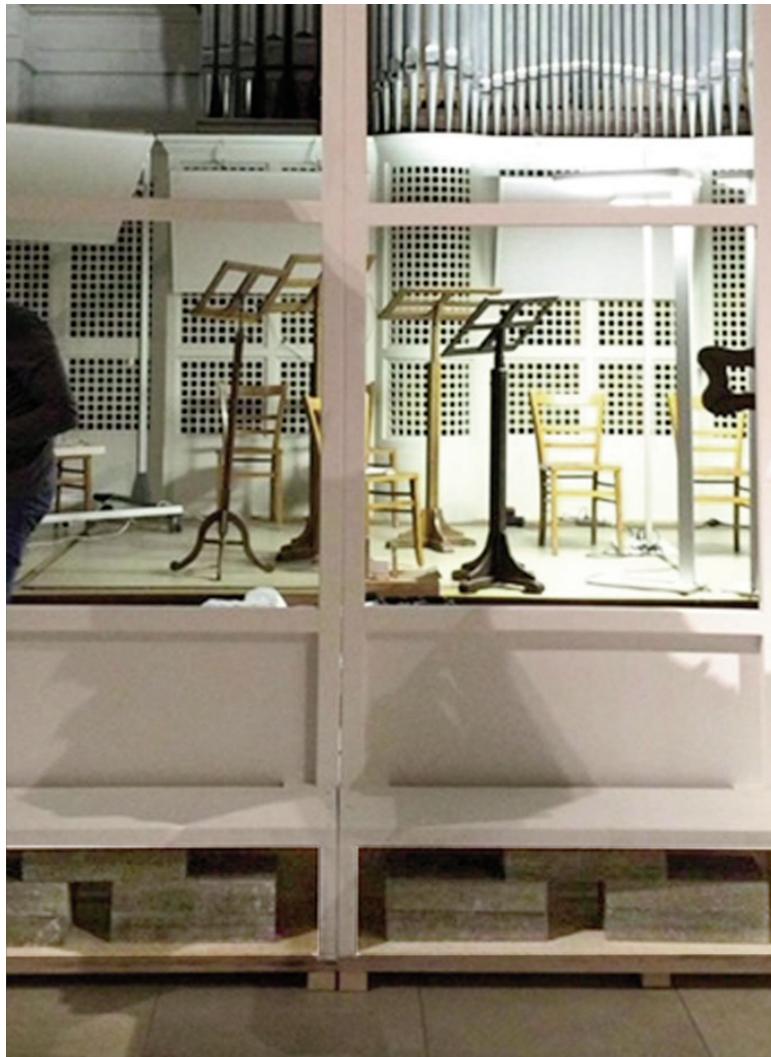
| Reversible foundations, concrete ballast elements (credit: R. Fonti, 2016).
